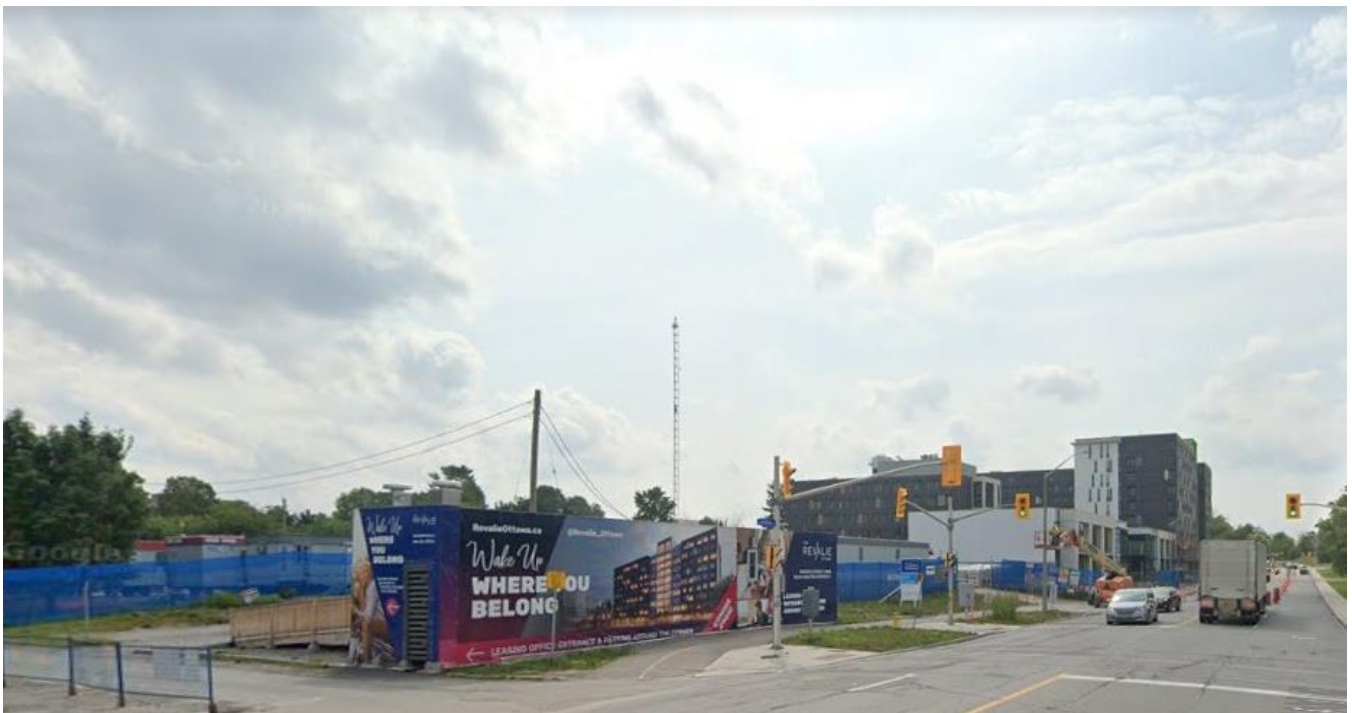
Site photo of the Subject Property looking west from Brookfield Road. Phase I of 770 Brookfield Road can be seen to the west.
